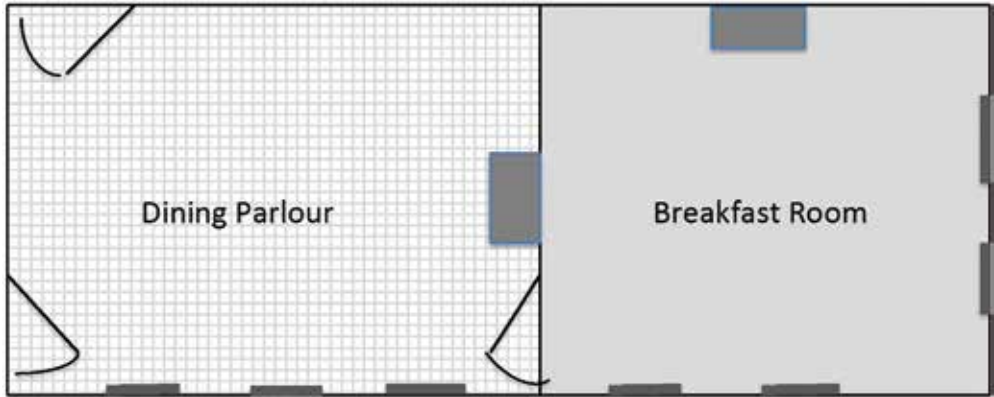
Schematic floor plan of the Dining Parlour and Breakfast Room, showing doors, windows and fireplaces.
